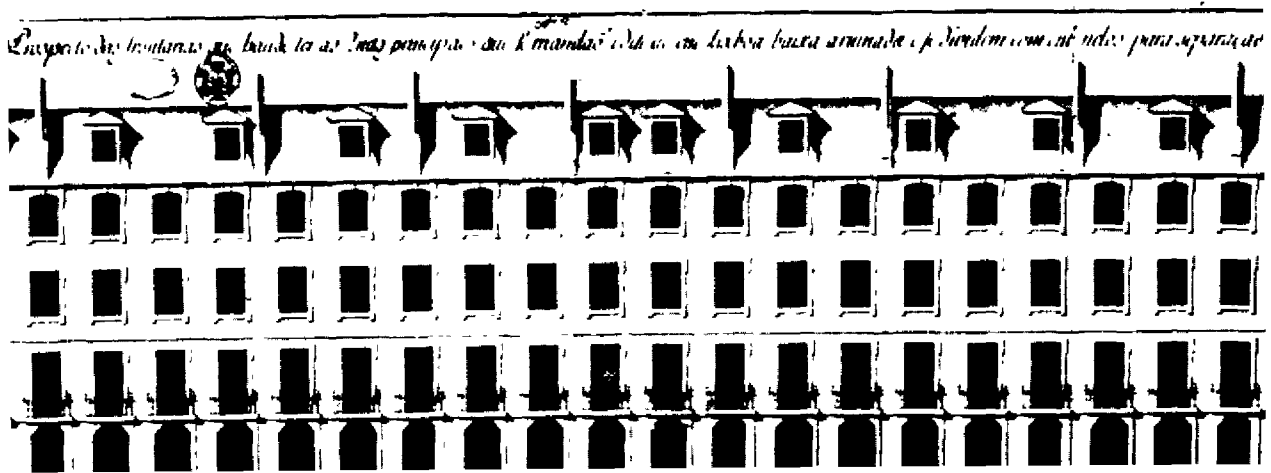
Elevation of reconstructed terraces indicating the fire breaks on the roof
